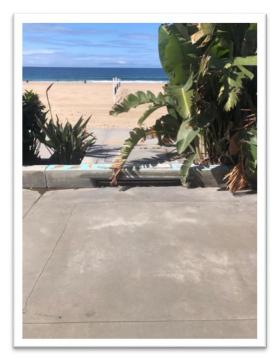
Strand Stormwater Sump #3 at 6th Place
